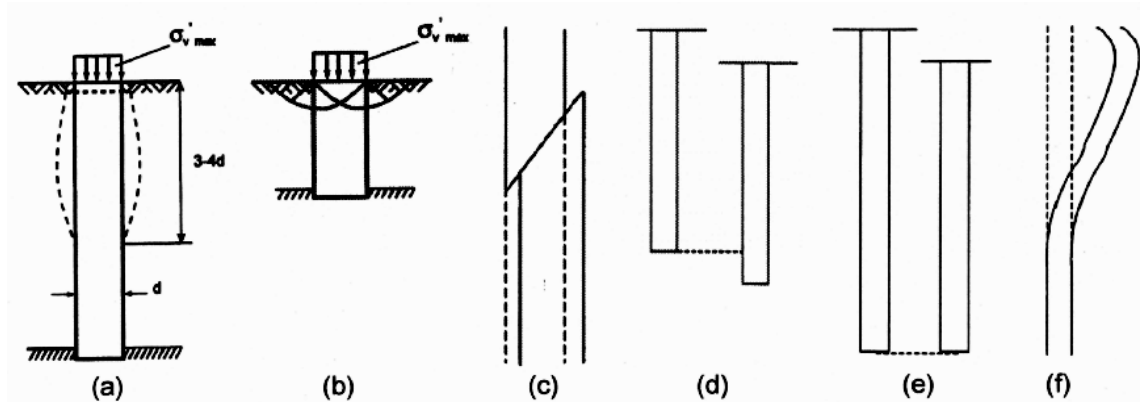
Failure modes of stone columns (Wood et al., 2000)
